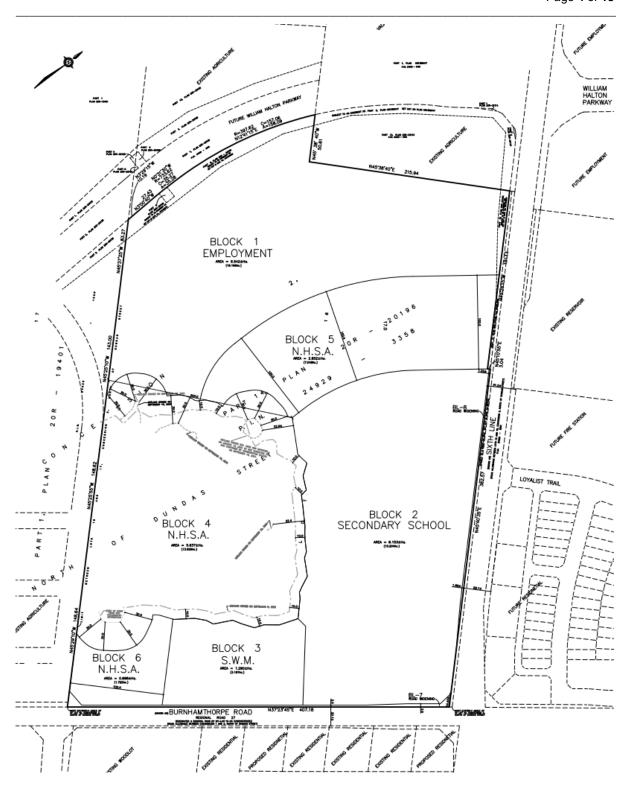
Draft Plan of Subdivision Excerpt without Contour Lines - NTS
